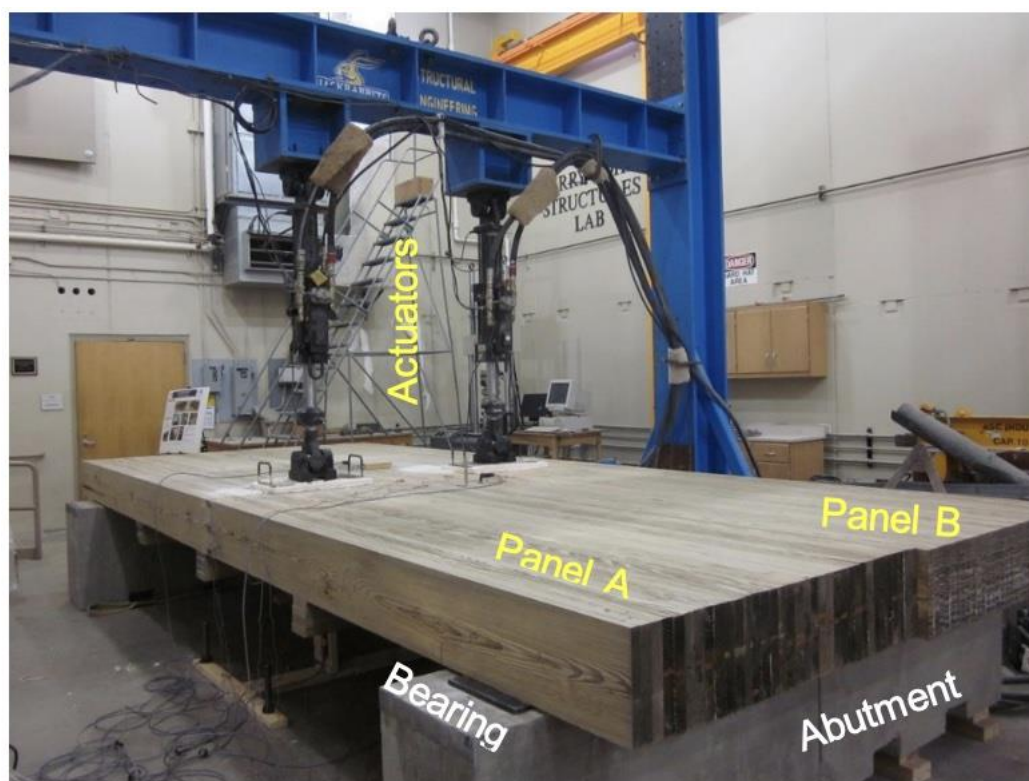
Fatigue Test Setup for Glulam Timber Slab Bridge
